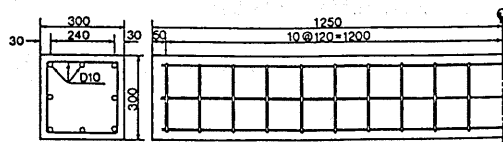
Cross-Sectional Dimensions and Reinforcement Arrangements of Specimen
